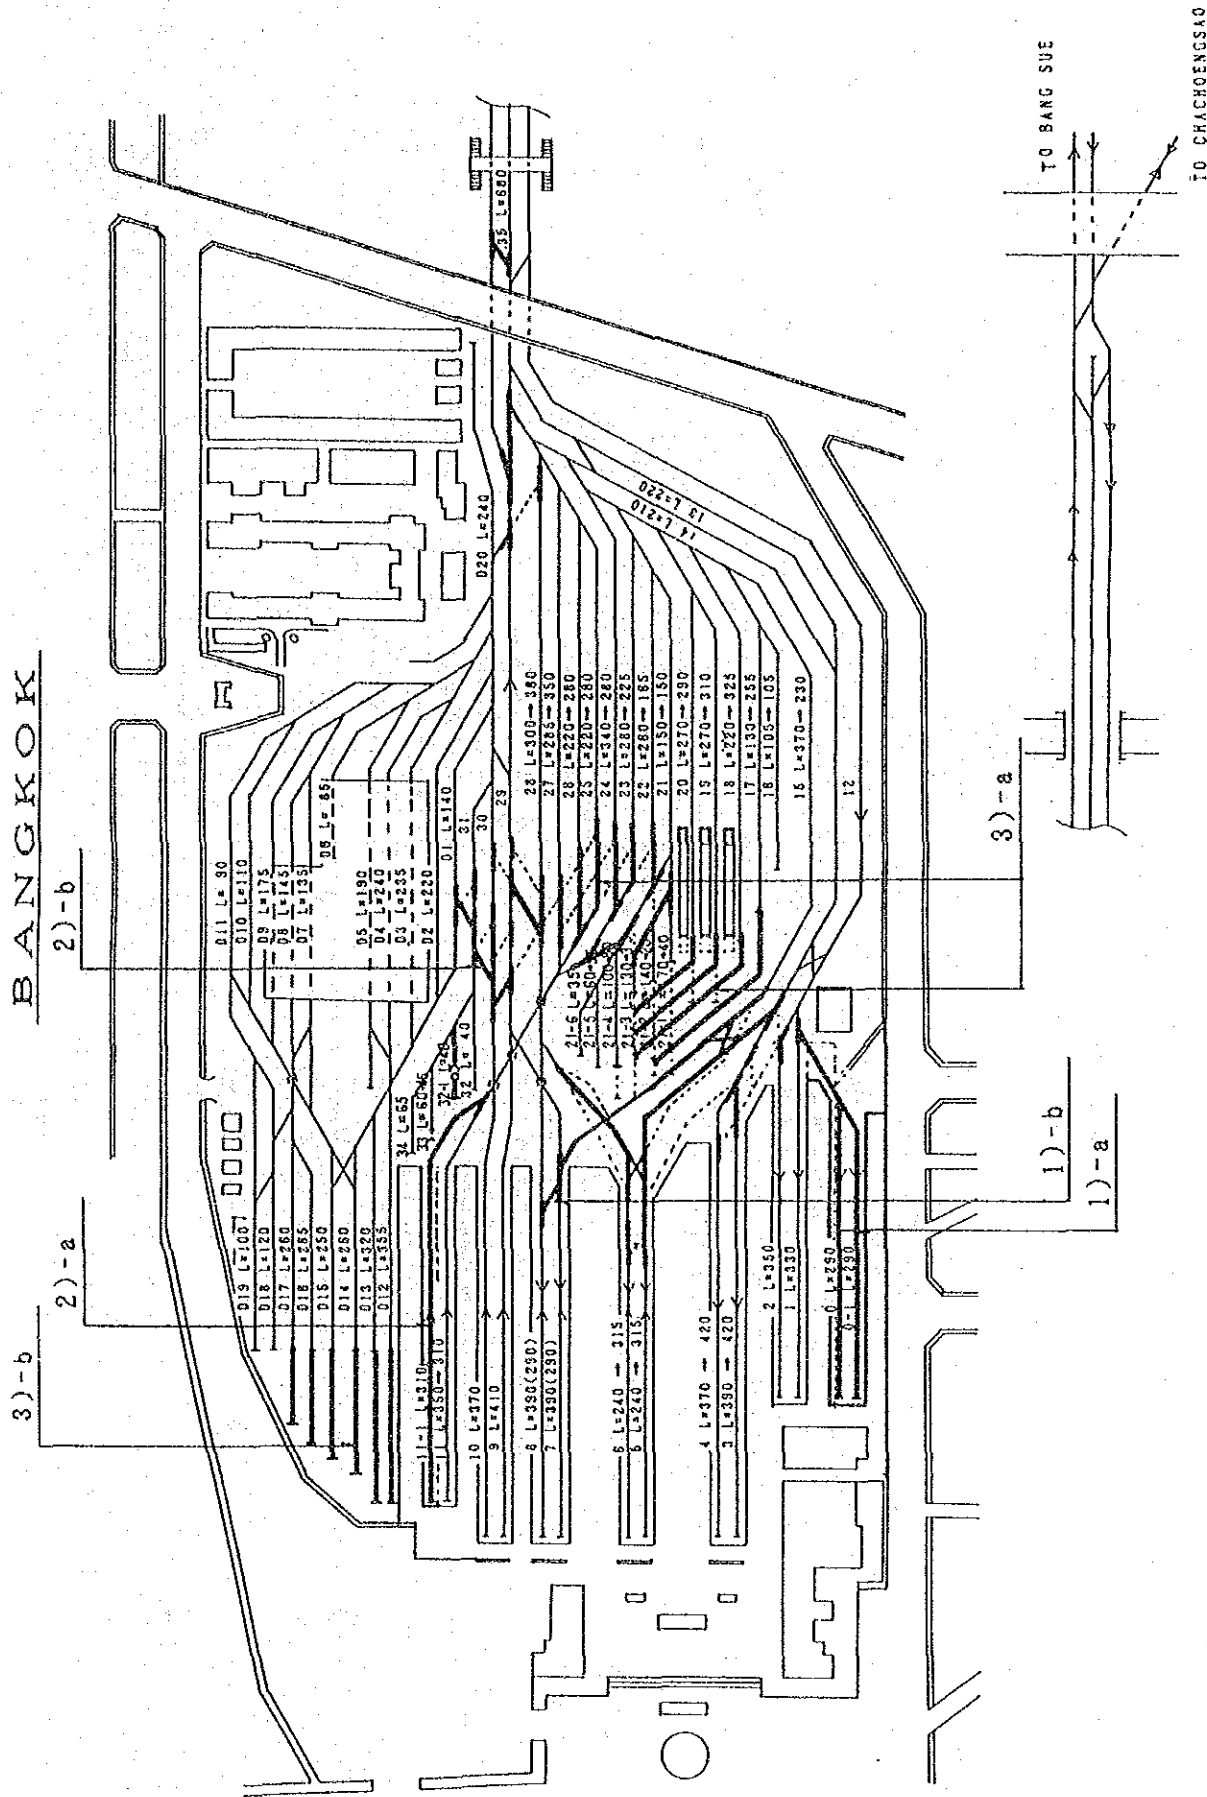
Future Track Layout at Bangkok Station (F/S Plan)
